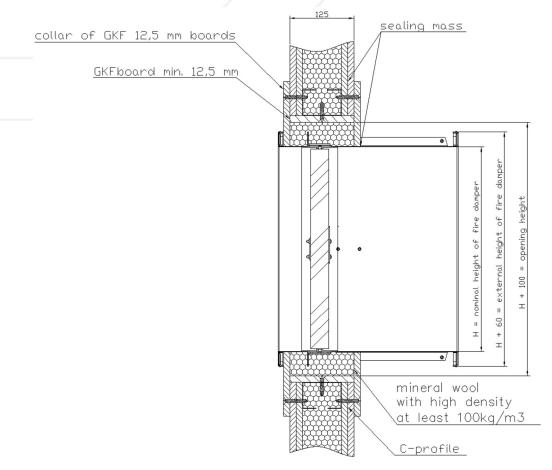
Installation method of fire dampers KWP-L in flexible wall 125 mm thick
